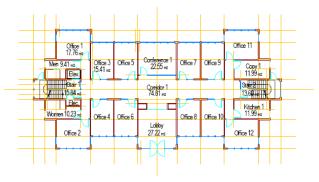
Geometry of the ground floor of an office building, as depicted in a typical architectural CAD tool.
